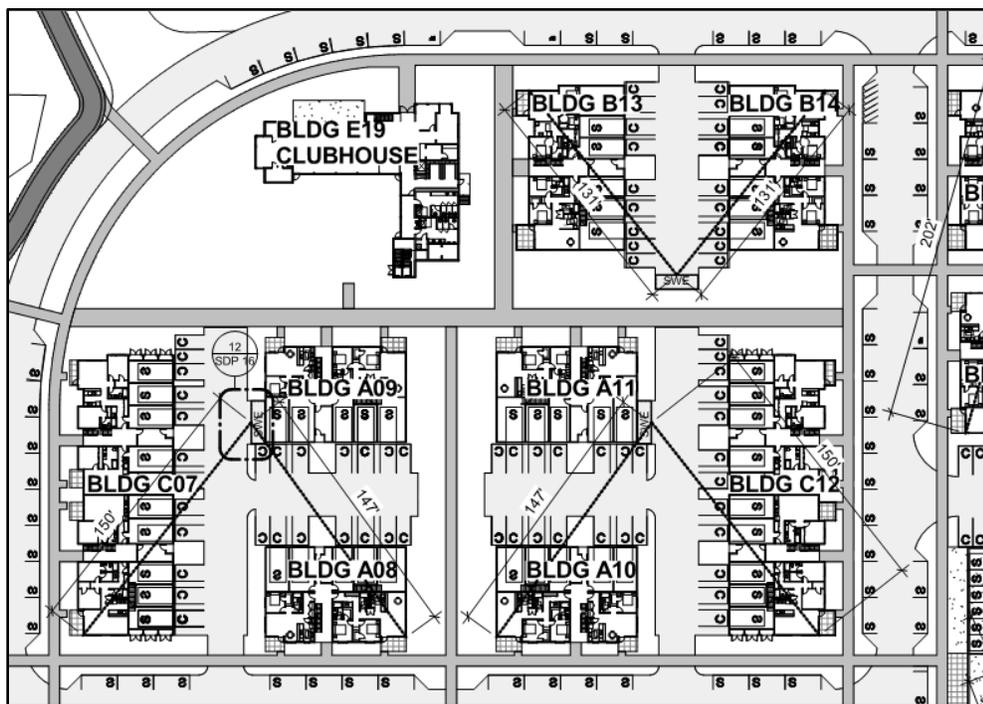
Typical locations of trash enclosures in the 3-story buildings (see sheet SDP 05)
